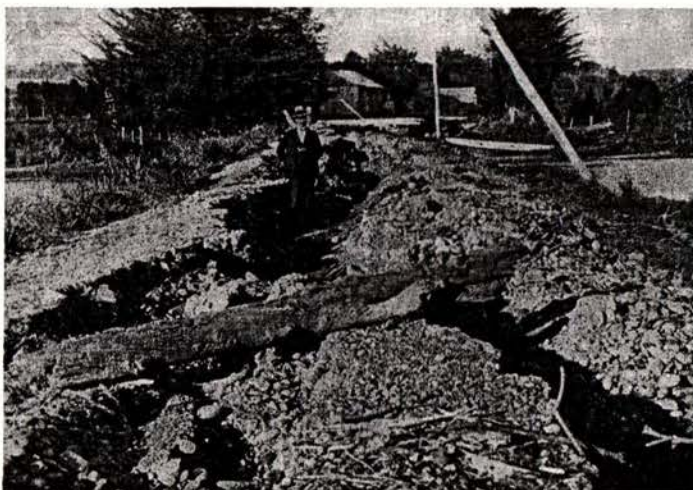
Cracks in ground at Quinlans Filling - looking South towards Karamea (photo courtesy of Karamea Museum)
